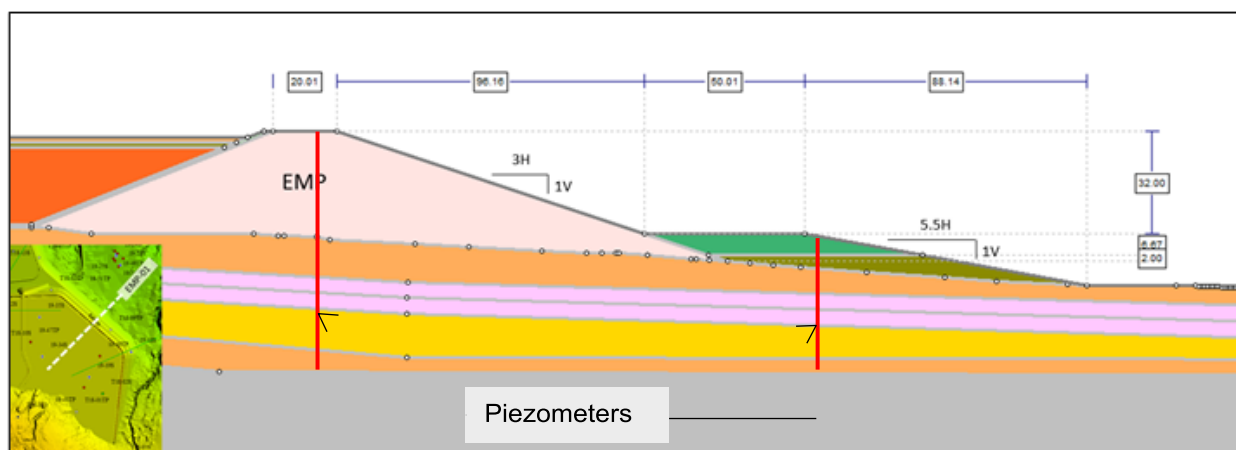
Piezometer proposed locations, section view (illustrative)
